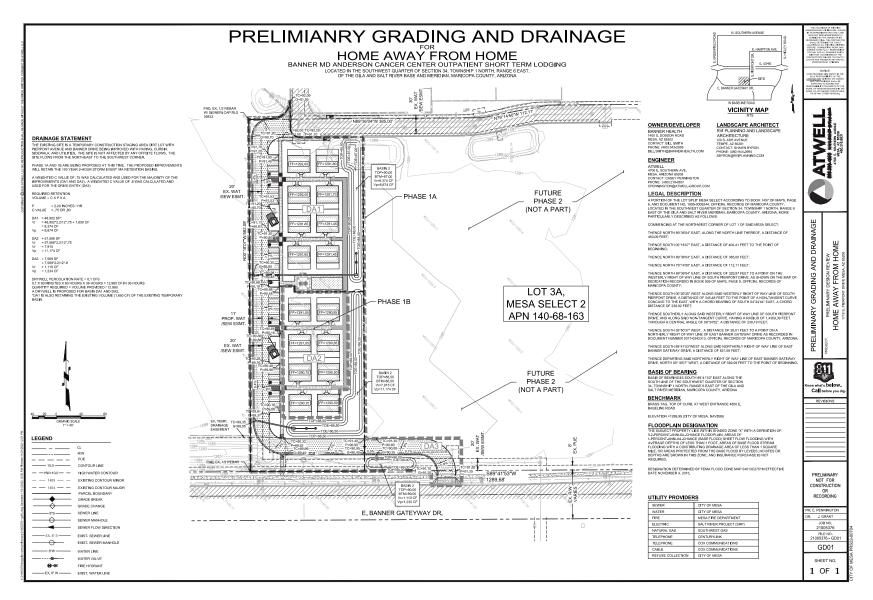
| PRELIMINARY SITE PLAN
